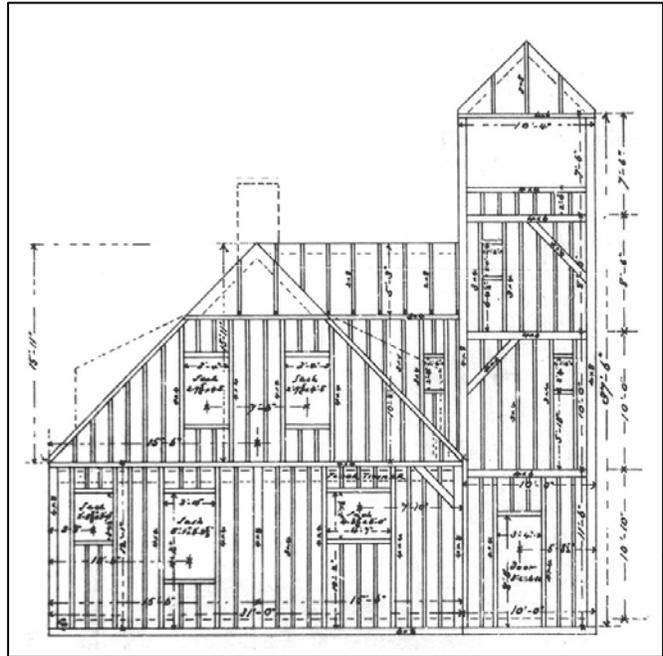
Duluth-type life-saving station, south elevation framing of Main Block and Tower.
